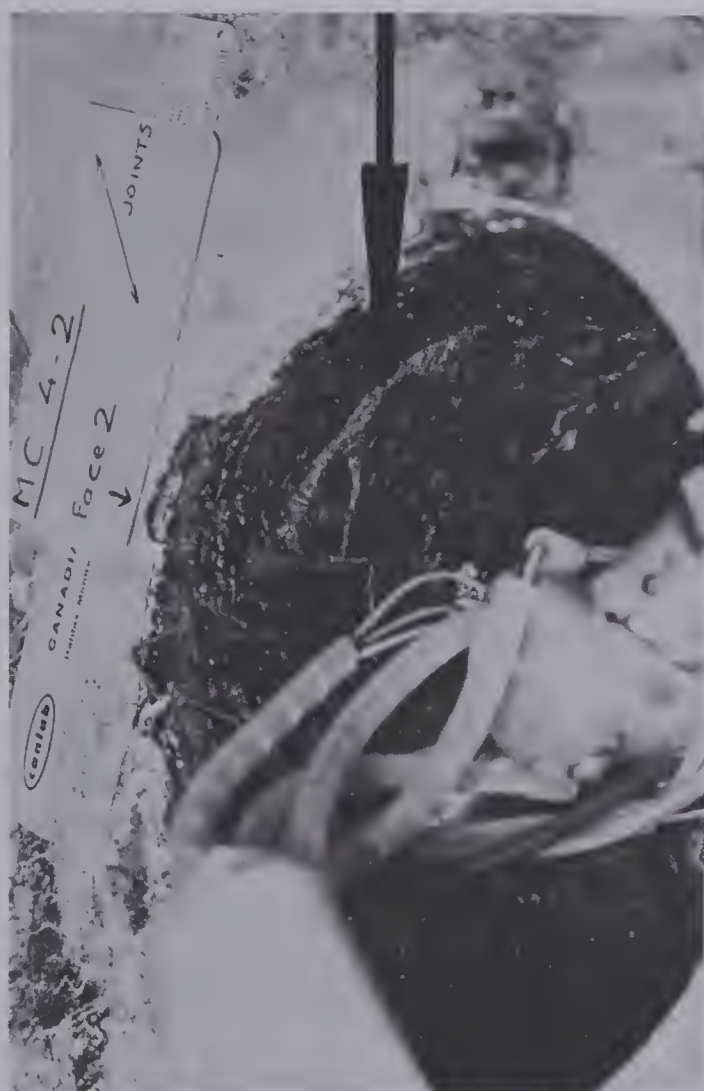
Sample MC-4 after the First Rupture : Ruptured Tunnel Wall and Debris
